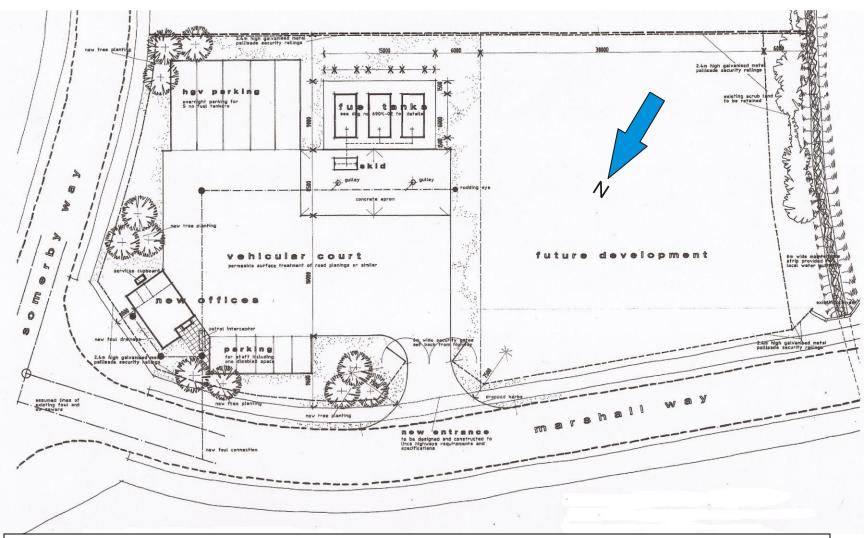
Block plan showing the proposed layout of the development site at an original scale of 1:200, (not to scale), (extract from Architects plan)
